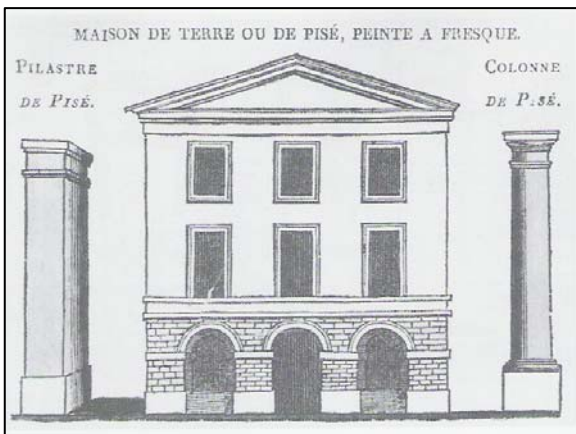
Design for a house, pilaster, and column of pisé. (Image: Louis Cellauro and Gilbert Richaud)
